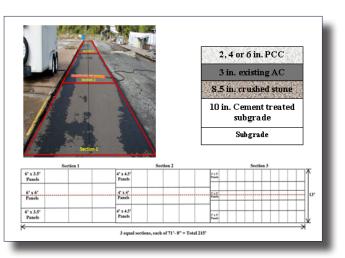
Existing AC test sections before overlay placement and BCOA pavement structure
